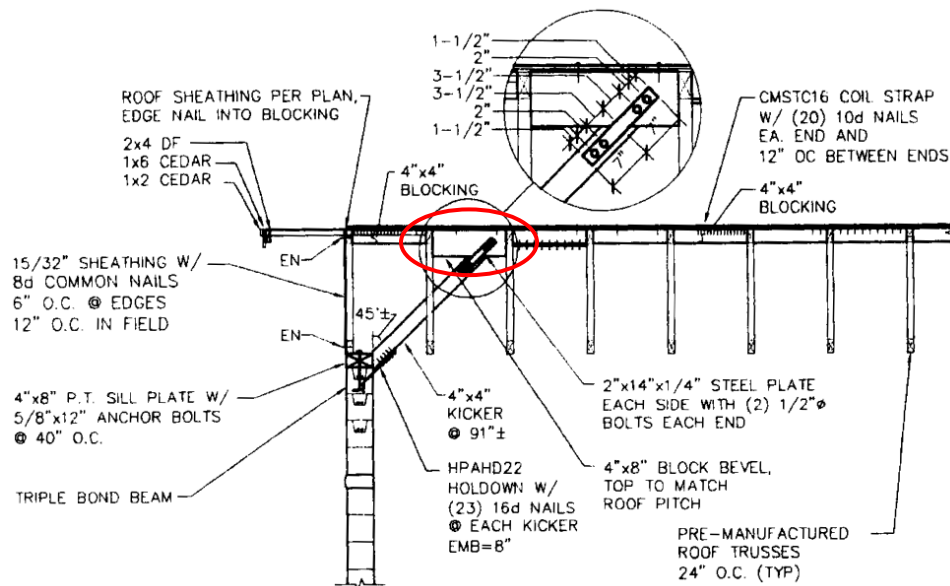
Inadequate Connection between Blocking and Roof Truss
